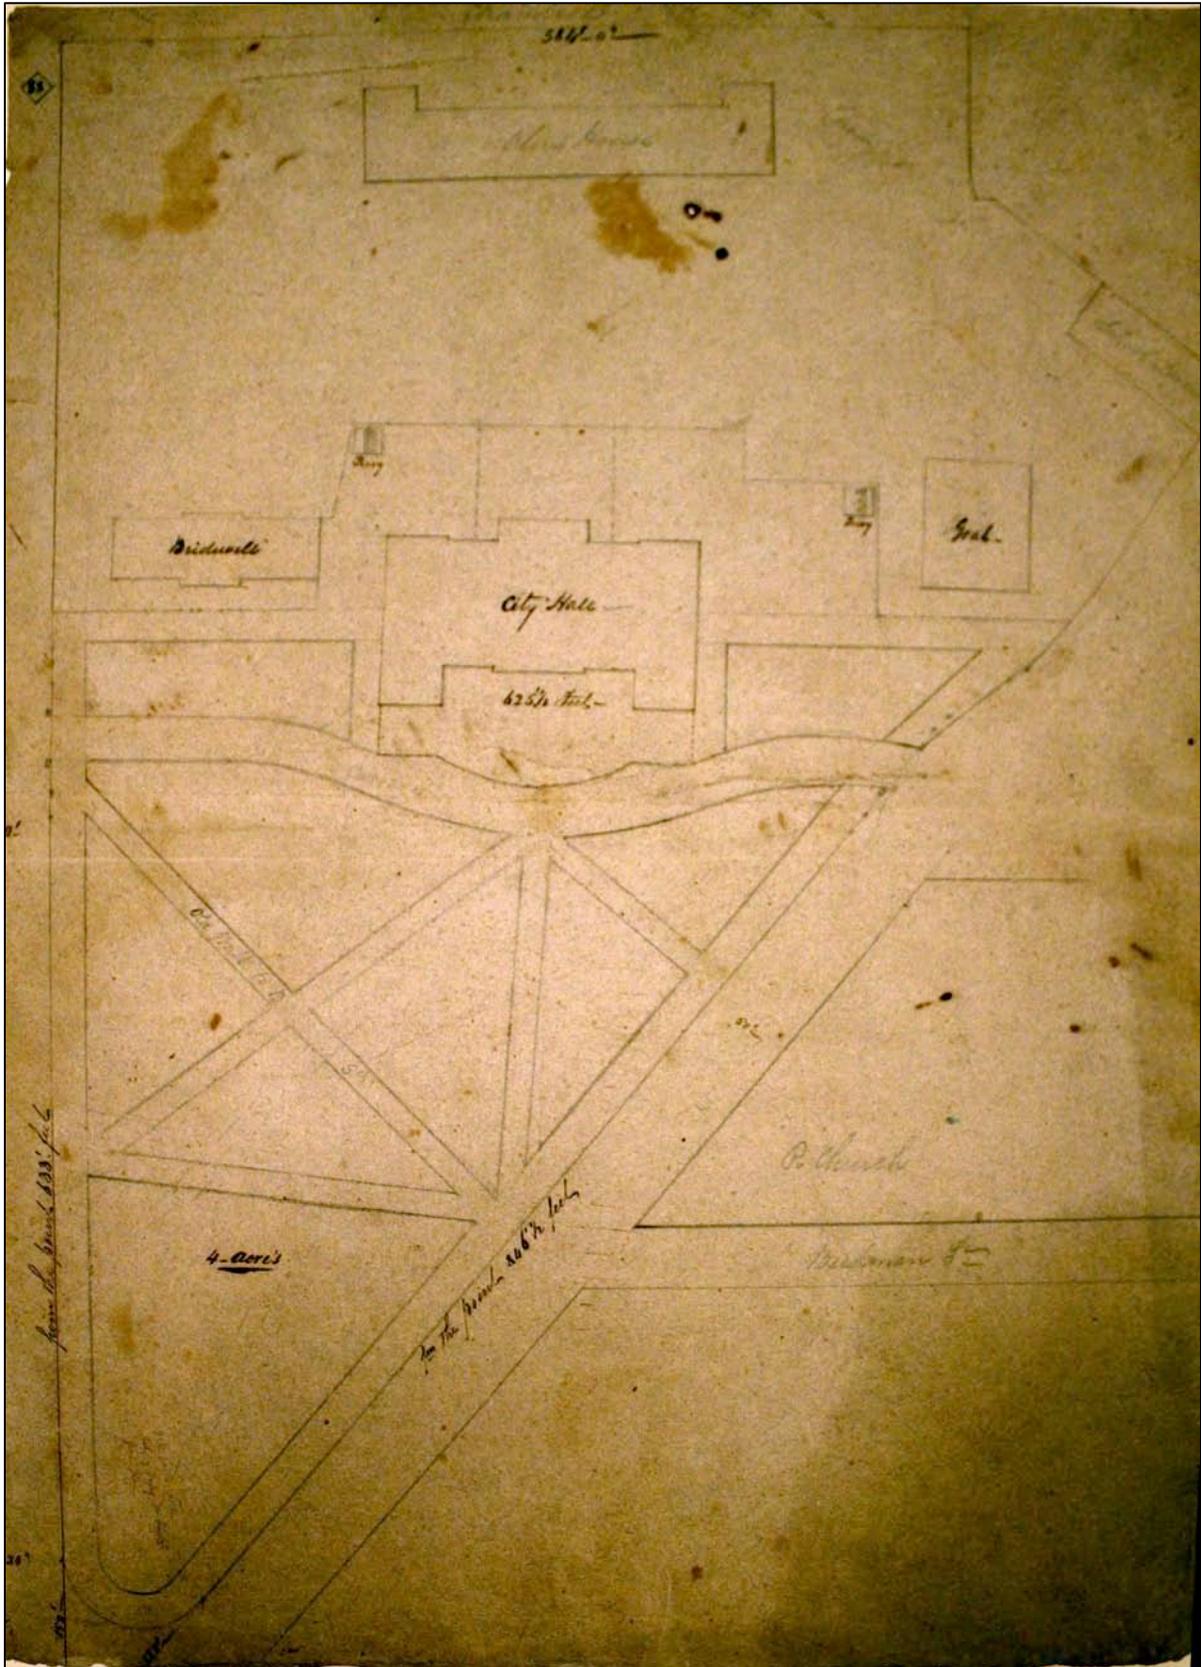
McComb's plan of City Hall Park with the proposed City Hall.
